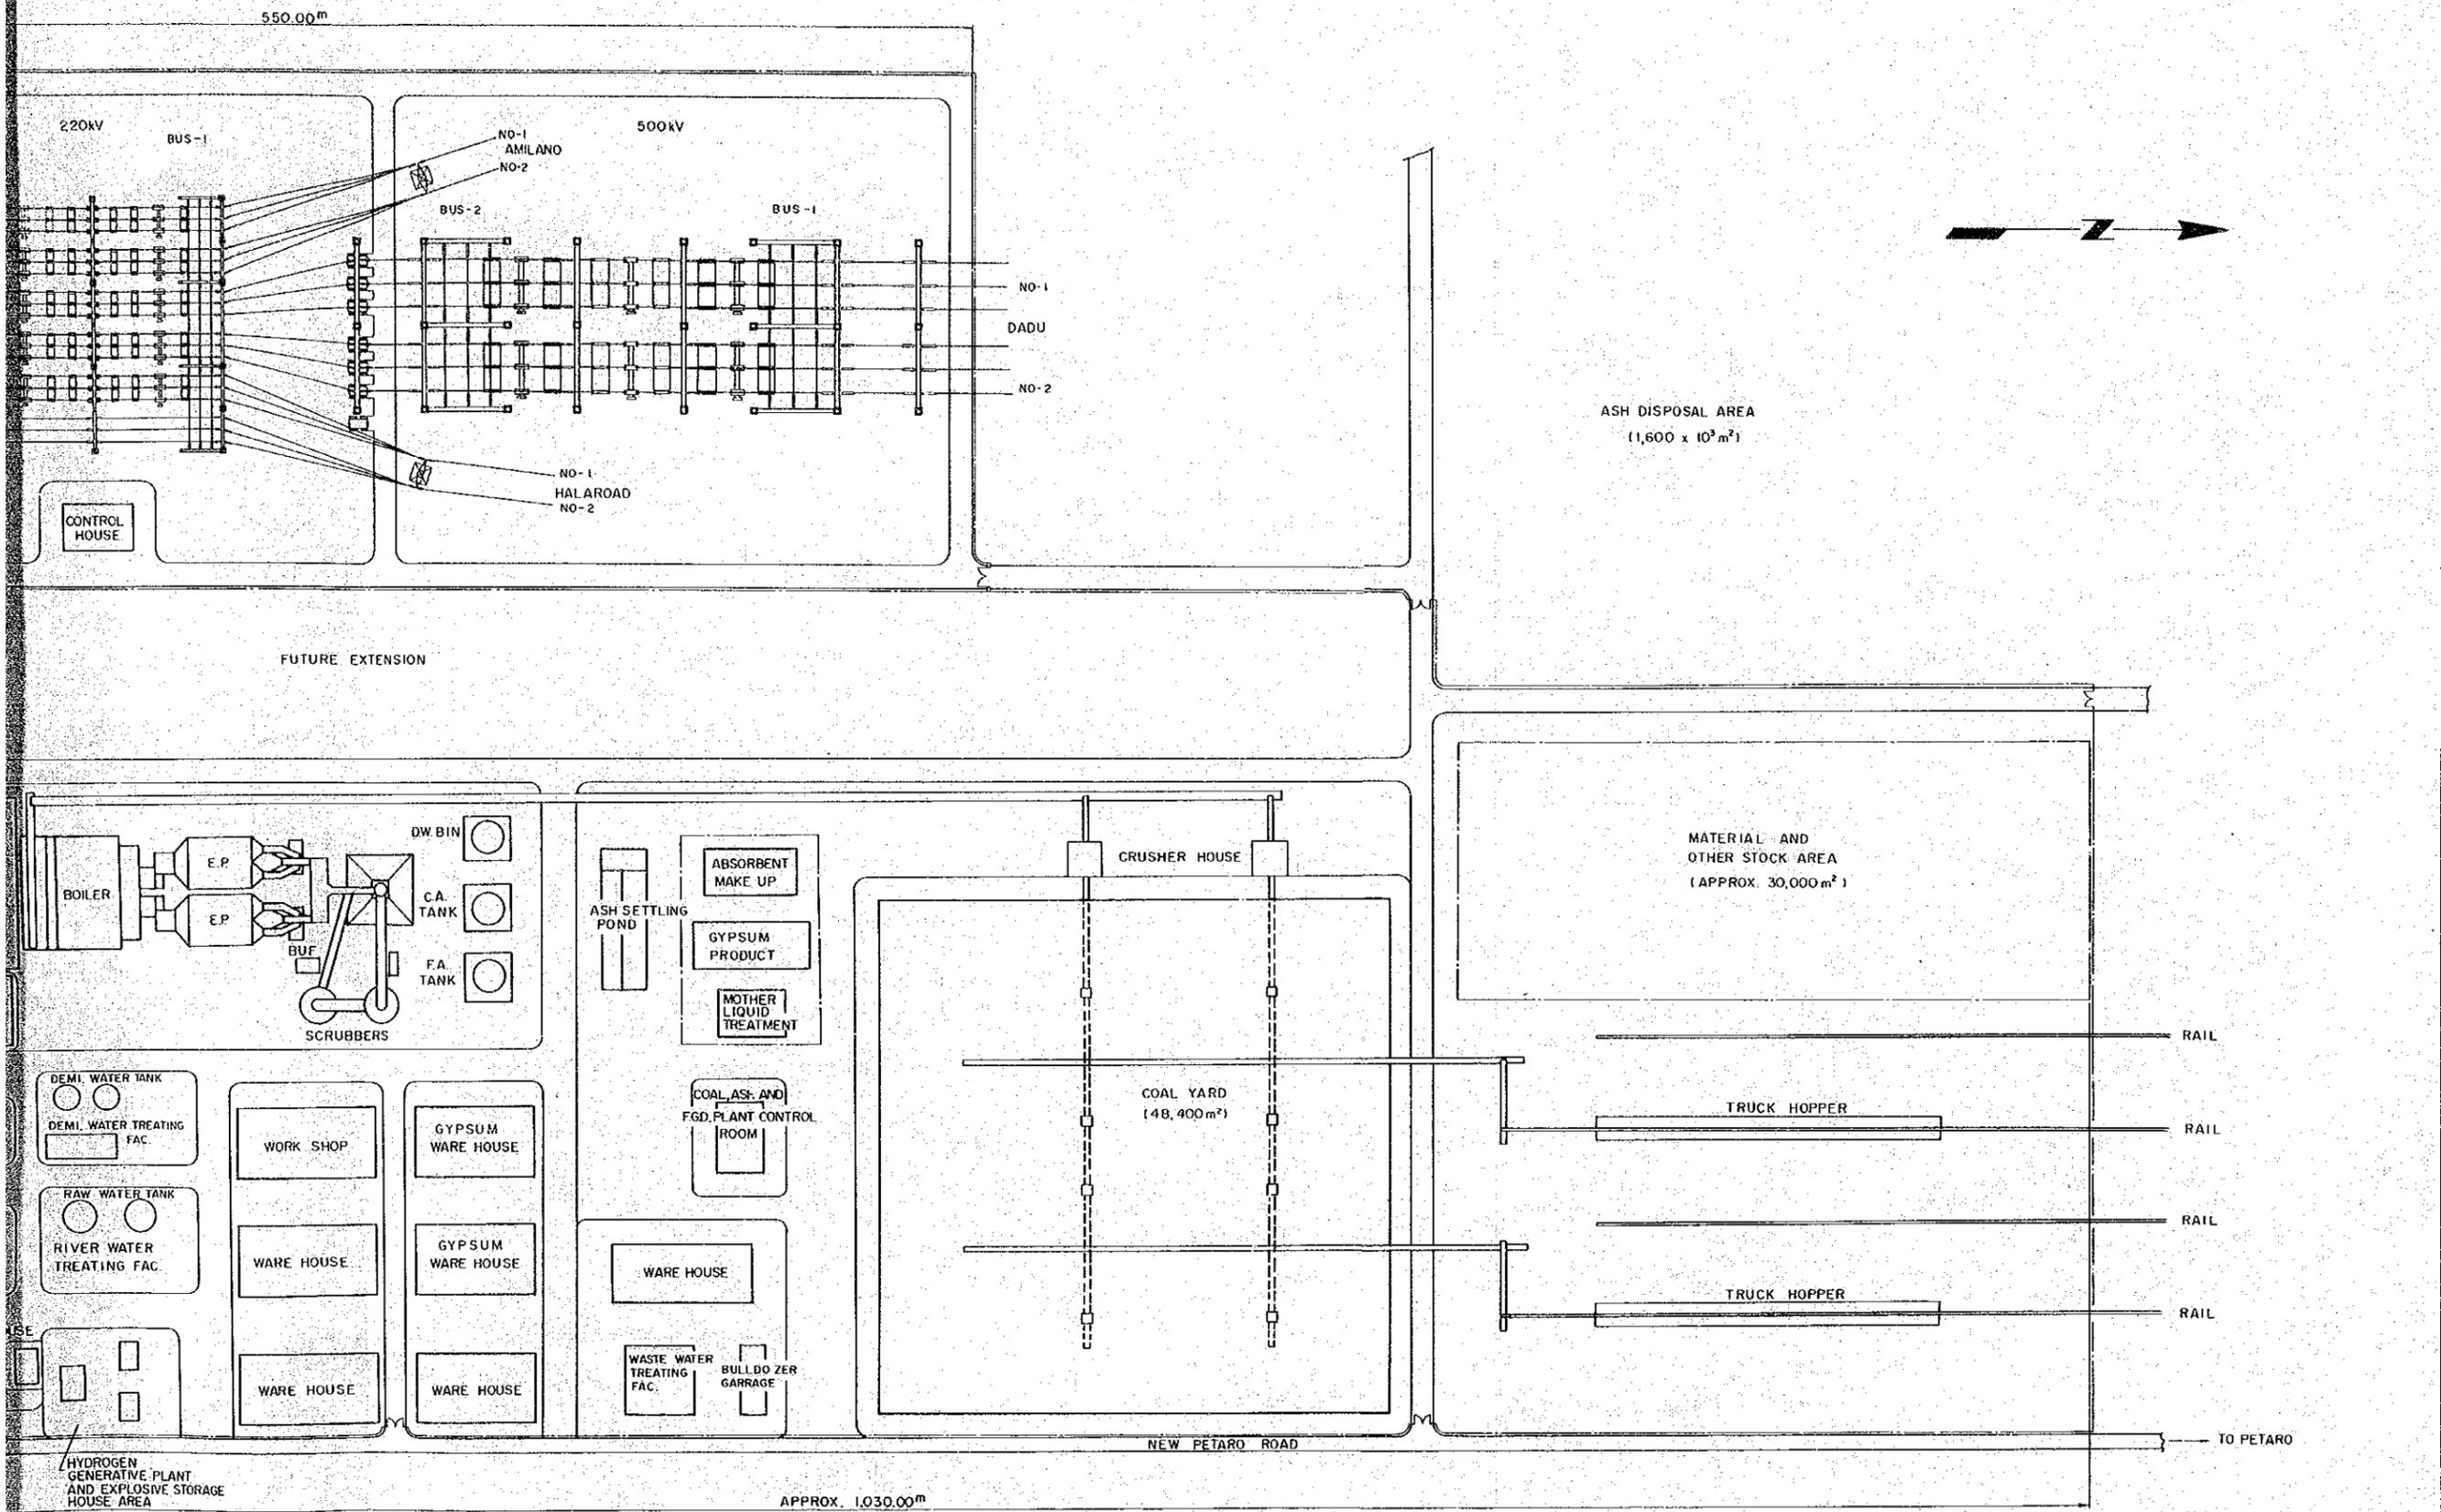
GROUND FLOOR PLAN (300MW)
